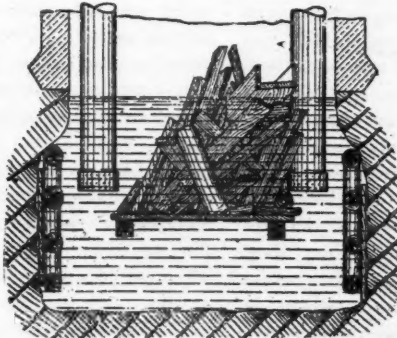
PIT BOTTOM BEFORE CLEARING BY DIVER.
